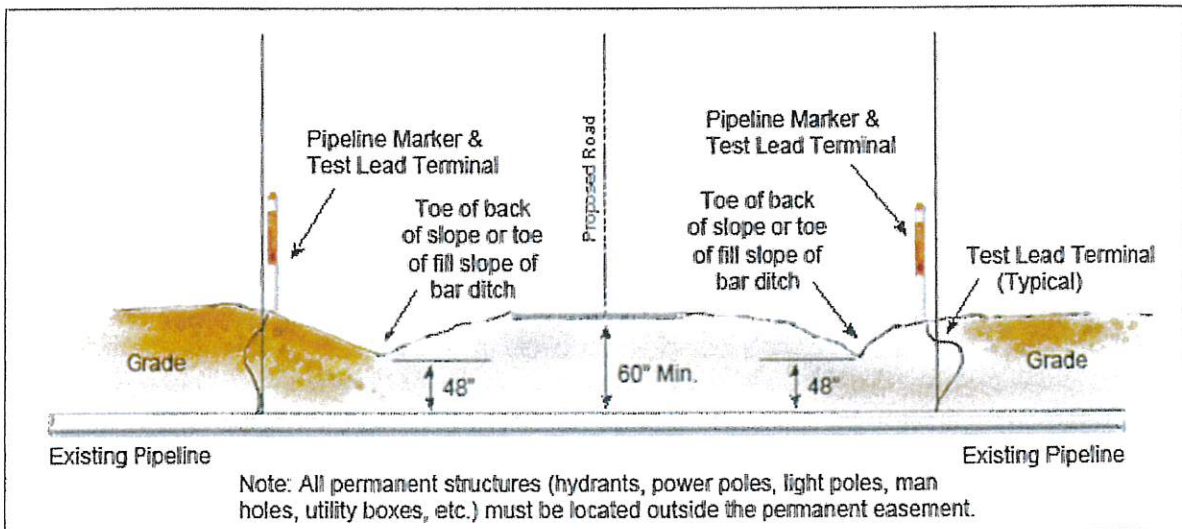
TYPICAL PROFILE DATA FOR PROPOSED ROAD CROSSING AND PARKING LOT.
